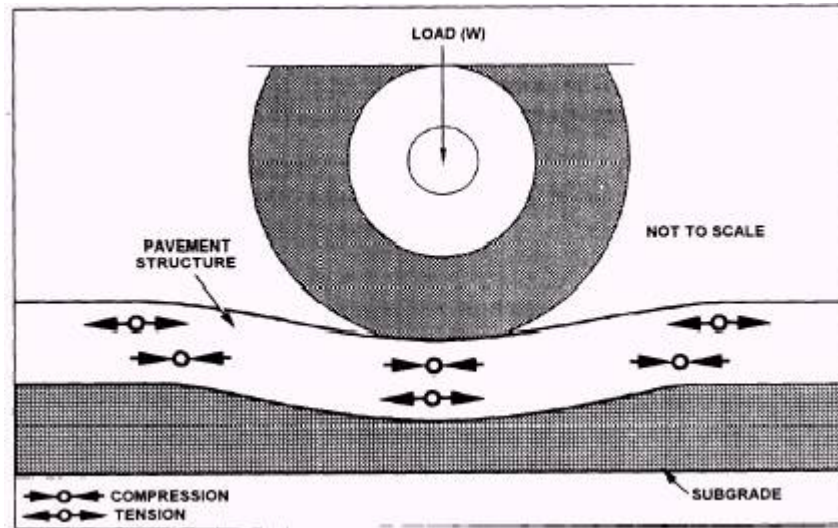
Pavement deflection results in tensile and compressive stresses in pavement structure.
